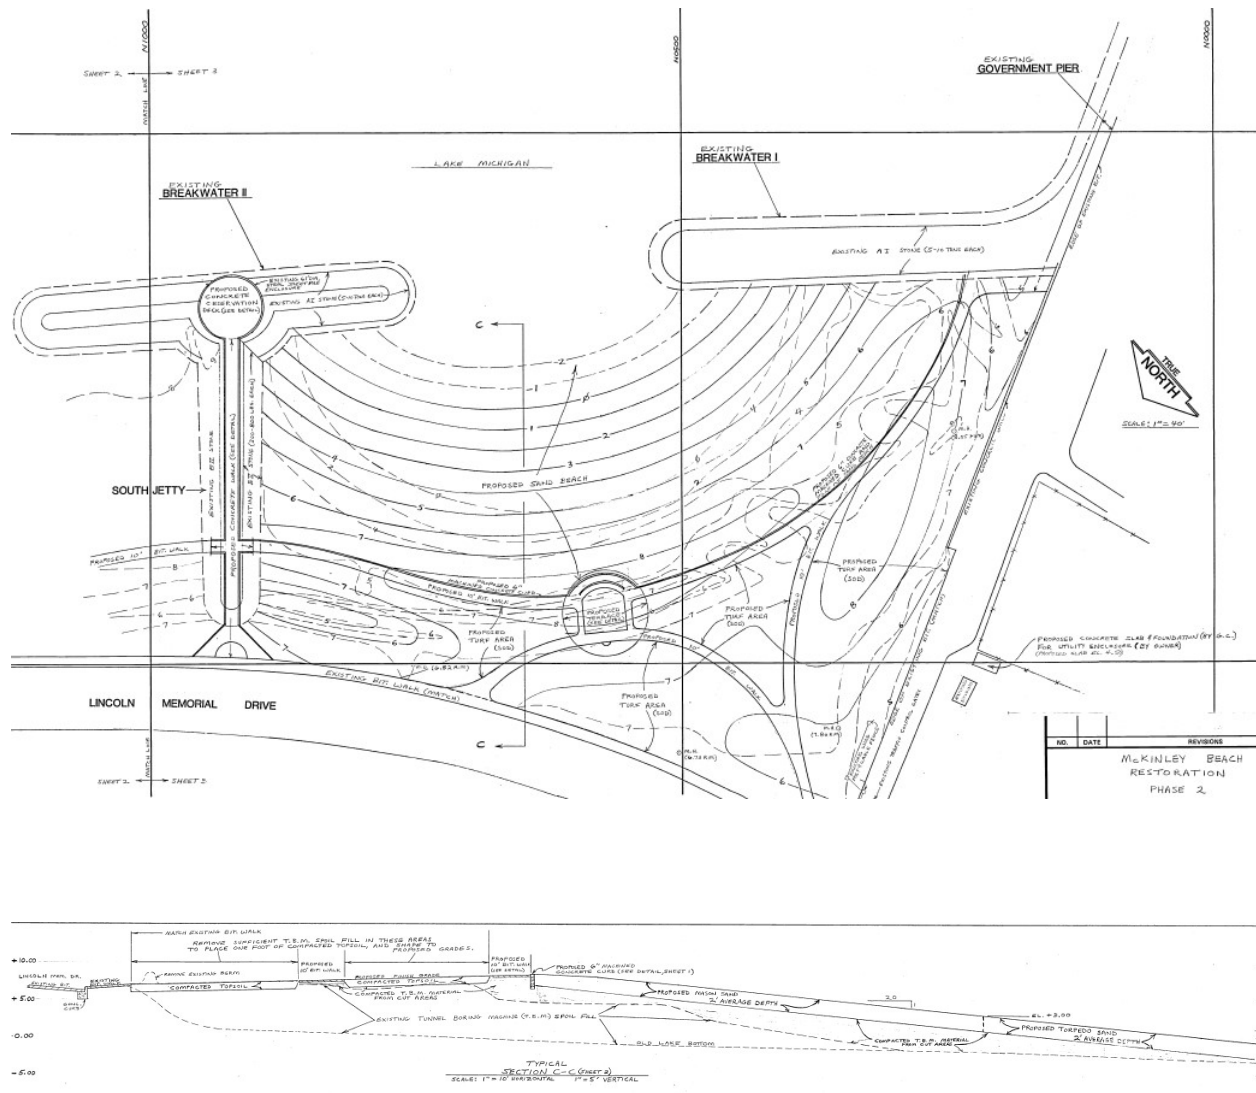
McKinley Beach Construction Documents, Plan and Section View
